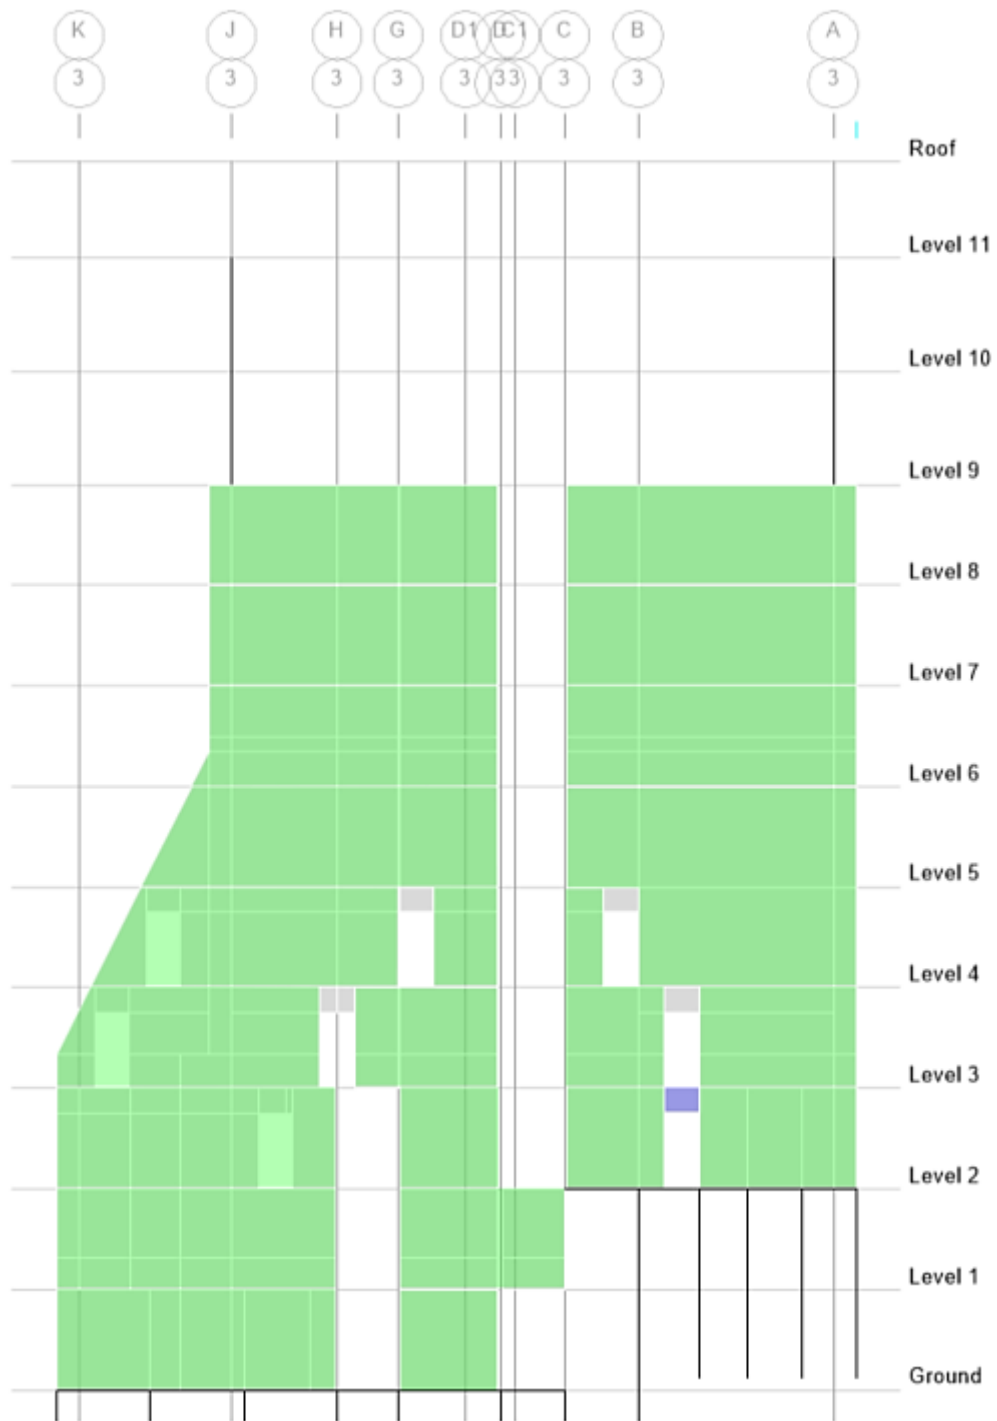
, Gridline 3 Transverse Direction Wall – North Structure
